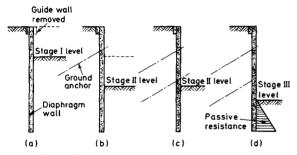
Stages in constructing a tied-back diaphragm wall. (a) Excavating to first stage in preparation for installing top-level ground anchors; (b) top-level anchors installed, excavation to second stage in preparation for installing bottom-level anchors; (c) bottom-level anchors installed; (d) excavation for third (final) stage
